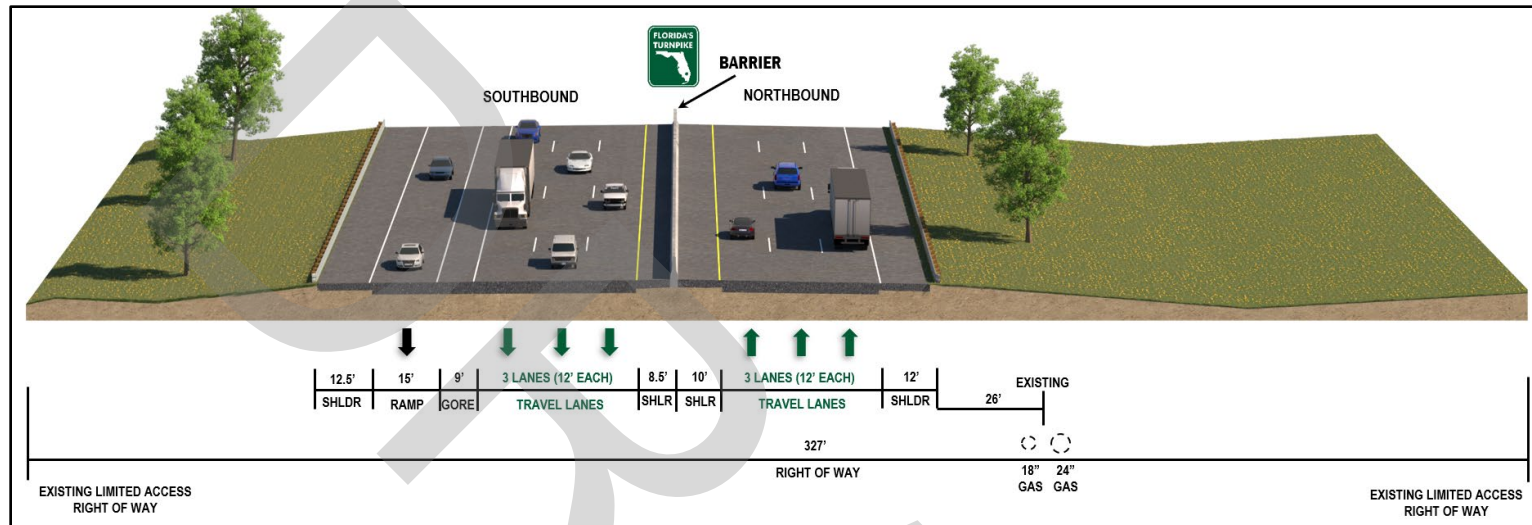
Existing Roadway Section between Wiles Road and Sawgrass Expressway
